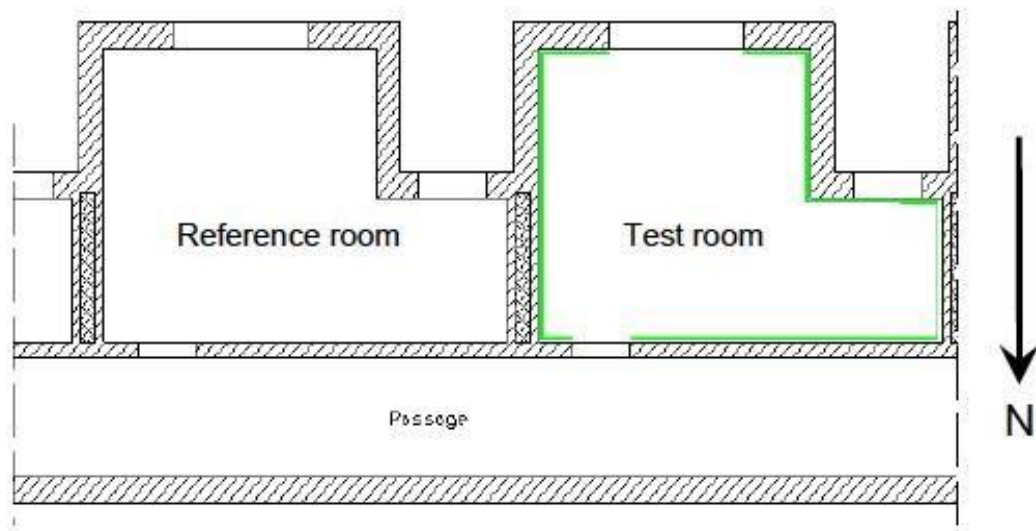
Overview of zonal floor plan (Lengsfeld K, 2008).
